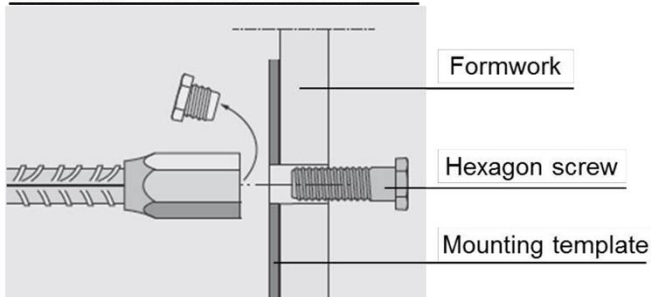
Installation principle for concrete-flush connection level: mounting template is attached to the formwork
